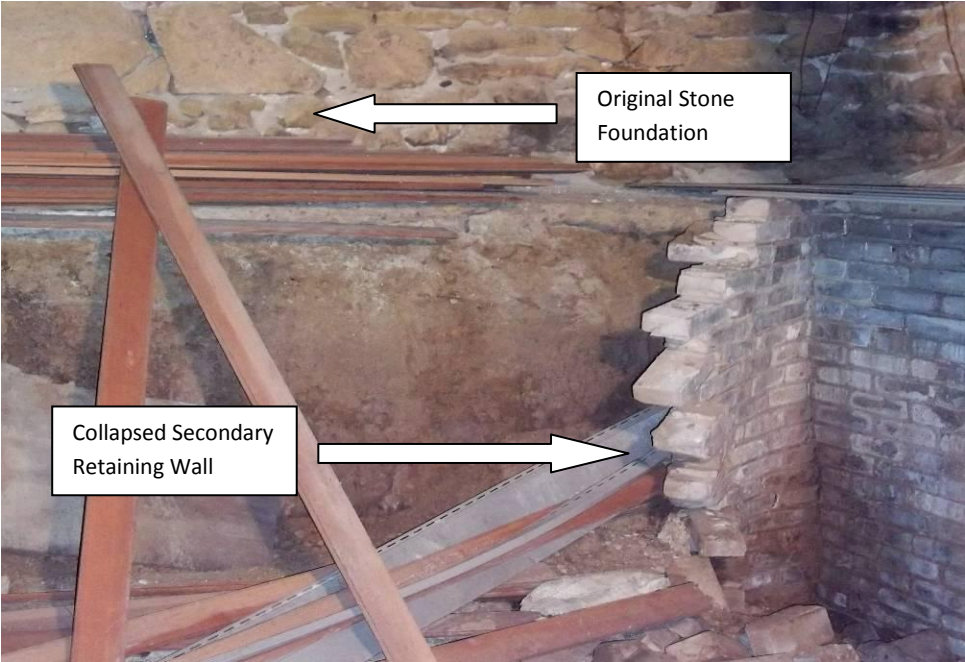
Northeast Corner of Foundation with Collapsed Secondary Retaining Wall
